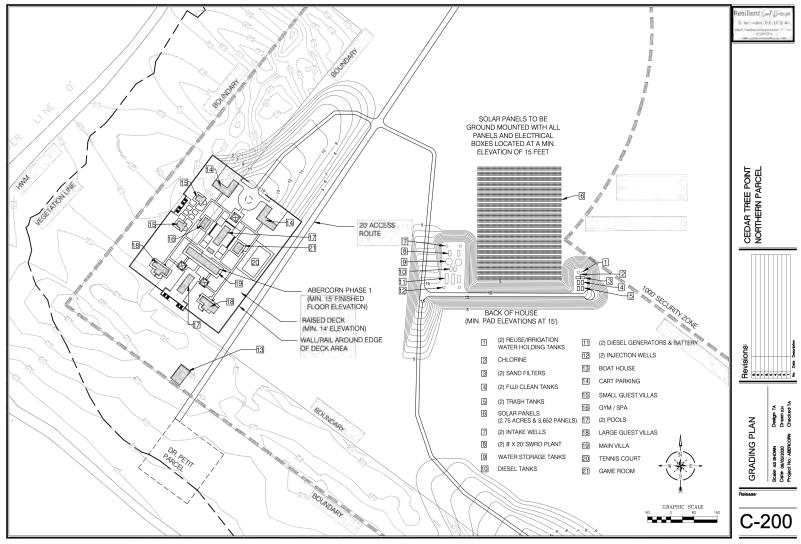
Preliminary grading plan for proposed Abercorn Residence and back-of-house area.
